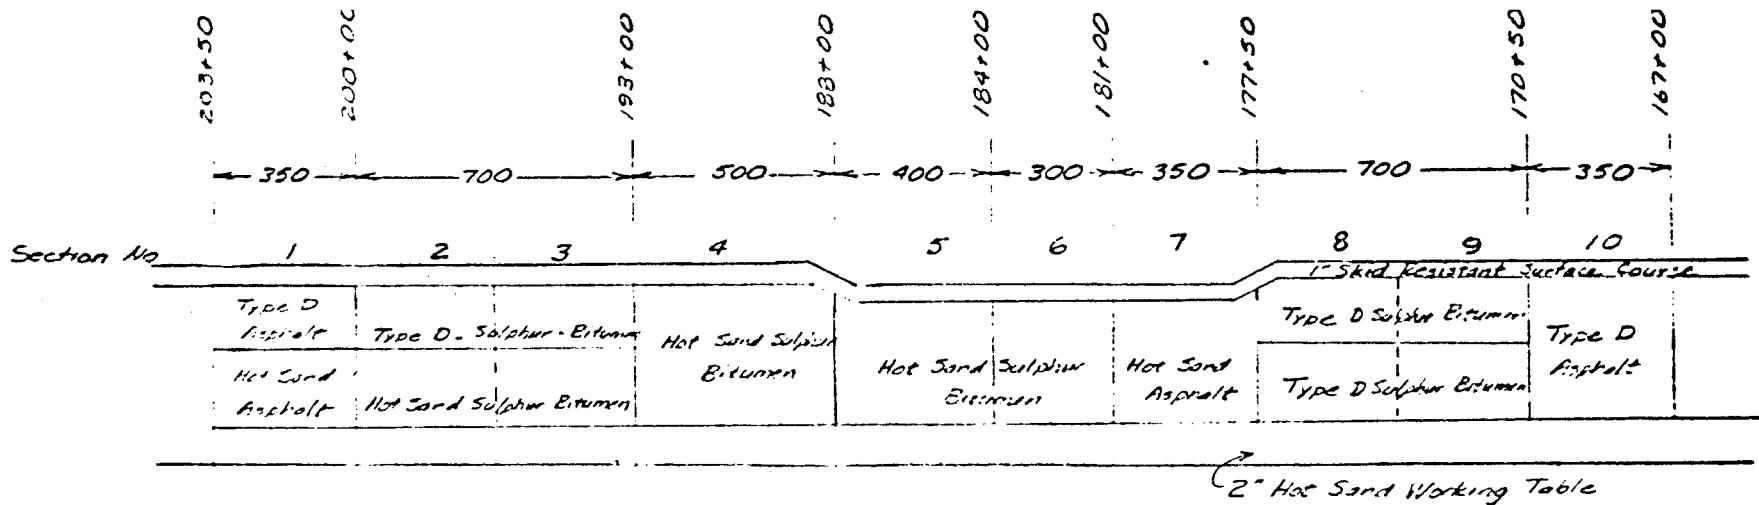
Layout of SNPA Sulphur Bitumen Binder Pavement Test
